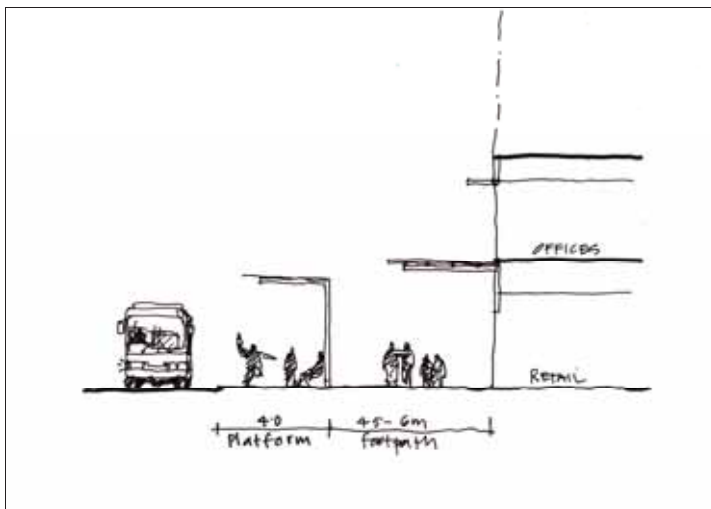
Sketch showing Horton Parade bus station cross-section
